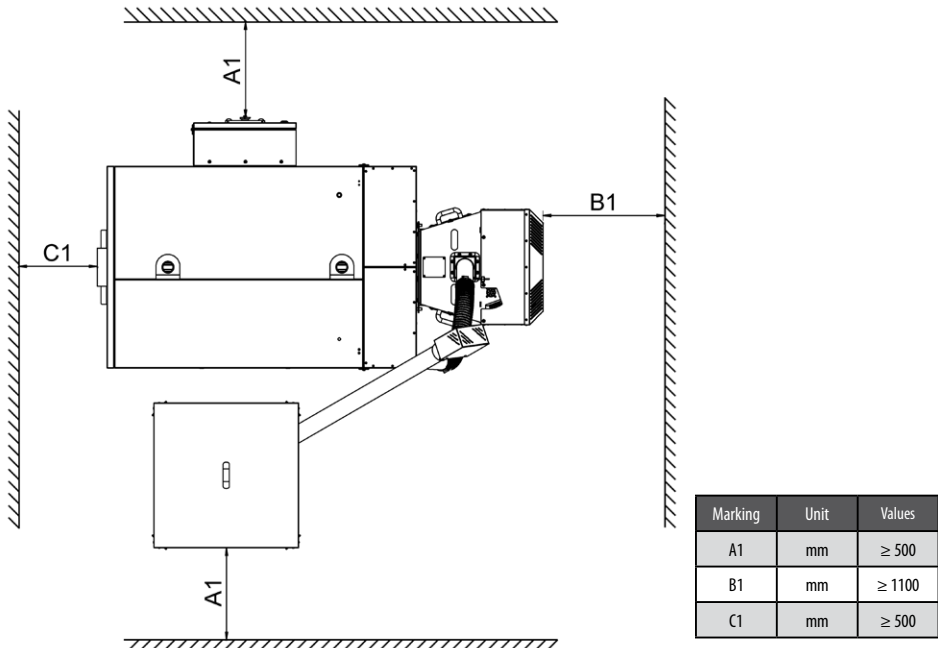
Boiler location in the boiler room - dimension diagram.
